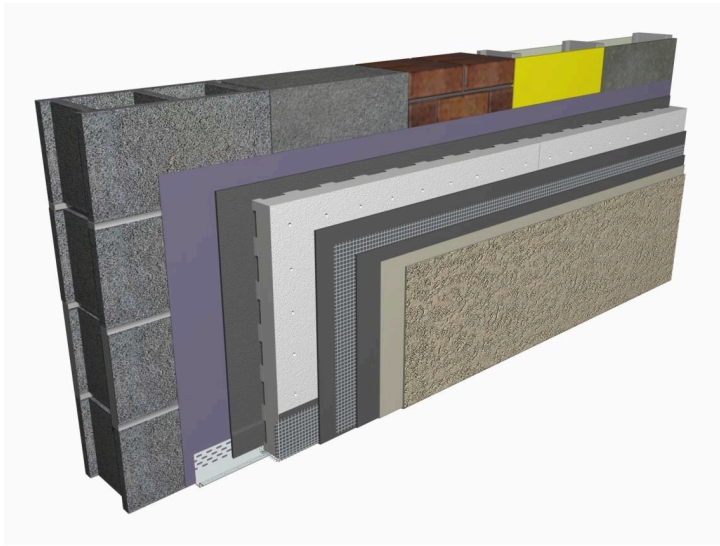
PUCCS EIFS with Roller Bear and Cement Bear over masonry, concrete, brick, glass-fibre-faced-gypsum board and cement board
